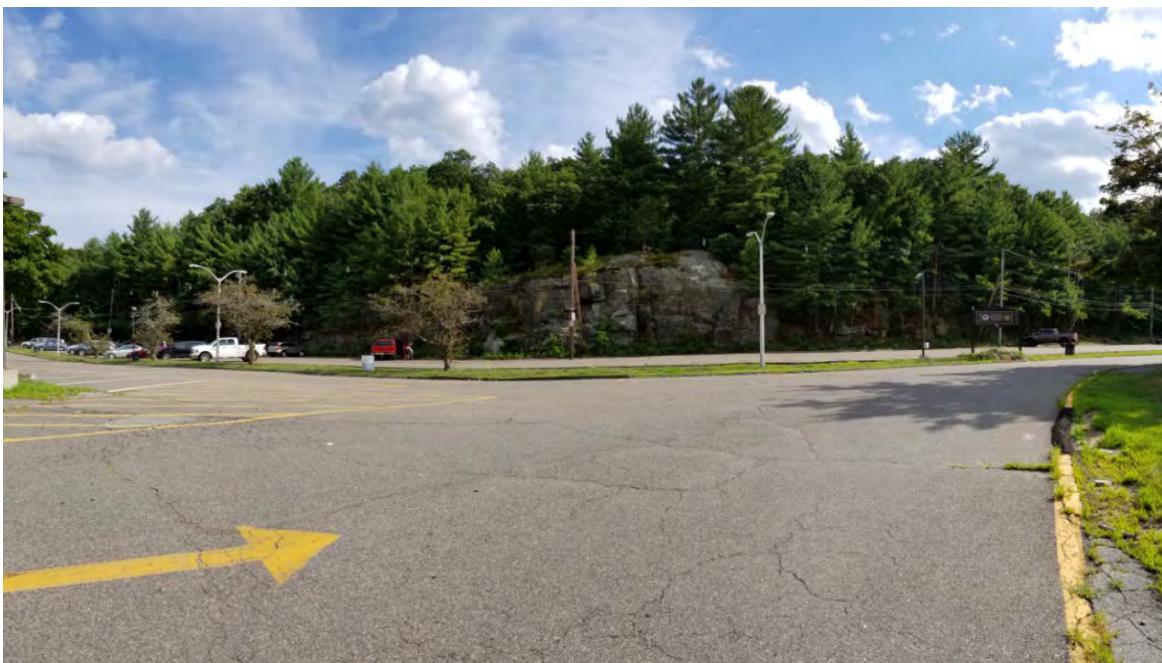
Standing on southern side of the building (near the edge of the parking), view facing south showing rocks and wooded areas at higher elevation
